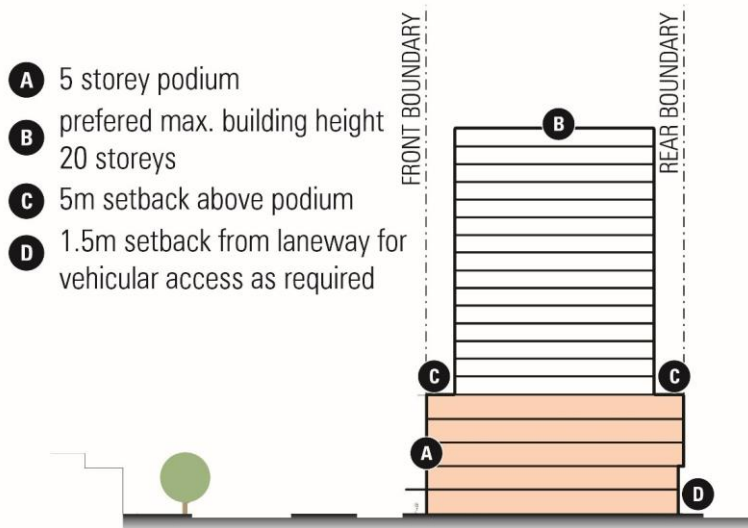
Sub-precinct F4 Illustrative Cross Section
